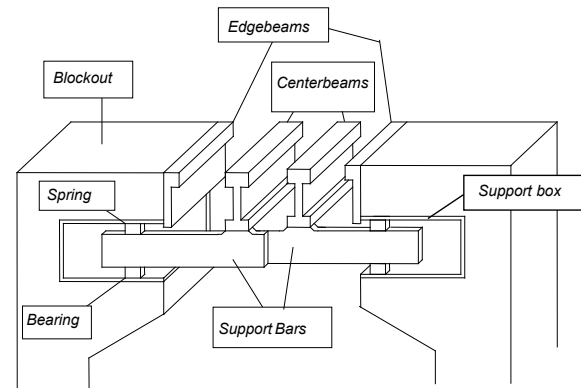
Cut-away View of Typical Welded-multiple-support-bar (WMSB) Modular Bridge Joint System (MBJS) Showing Support Bars Sliding within Support Boxes
